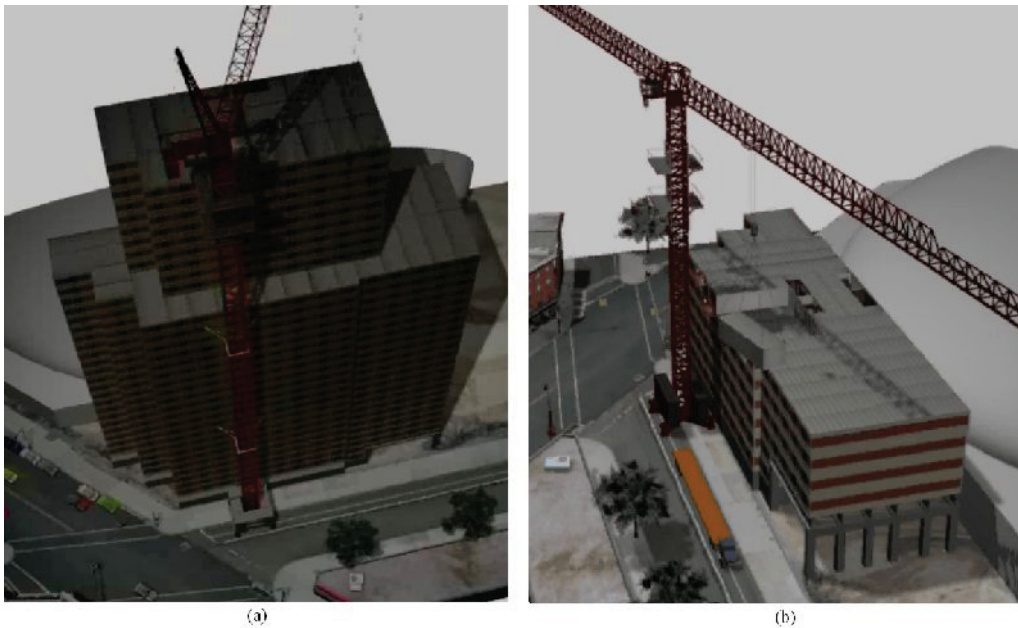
34-storey modular building construction using (a) single-jib tower crane, or (b) double-jib tower crane
